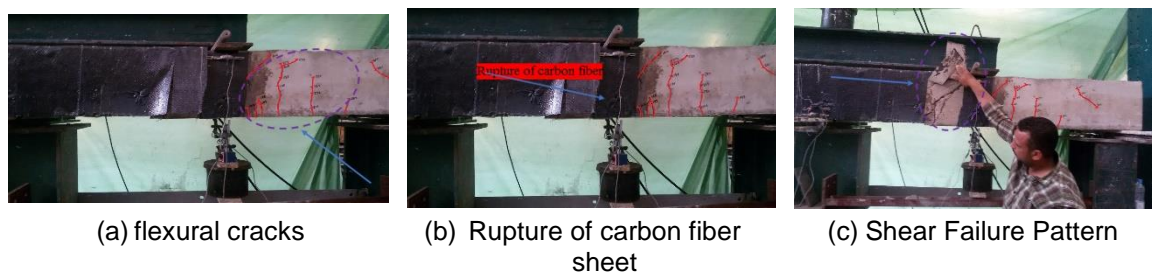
Cracks mapping and failure pattern of beam B-CFRP.
